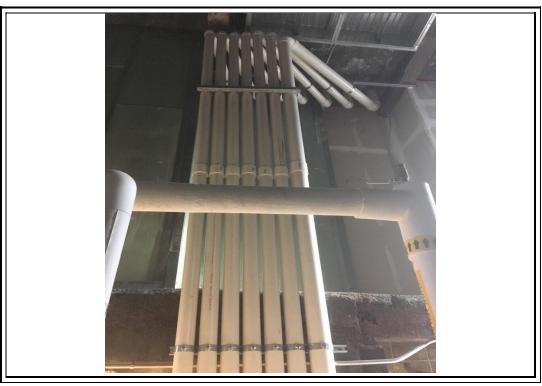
Riser pipes for individual subsystems extending to/through the building roof (12/05/18).
